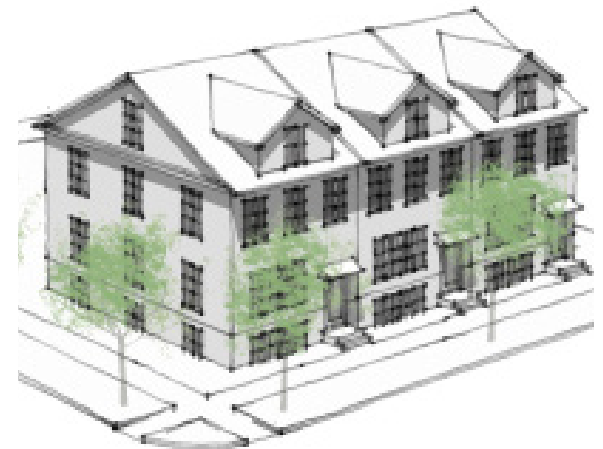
Row building example with stoop entrances, visible basement, and a pitched roof with gables
